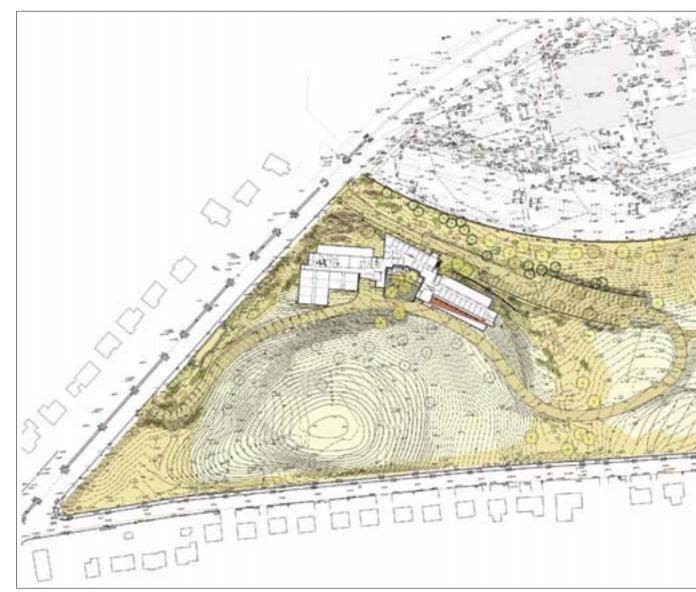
Site plan with topographic detail and building footprint for the Weld Hill facility, by Reed|Hilderbrand.
